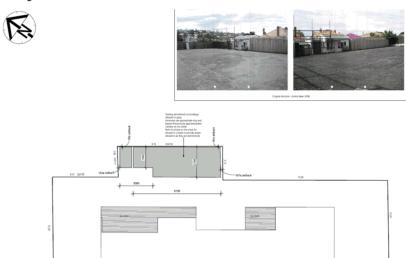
Existing site plan showing now demolished outbuildings (shaded grey)
